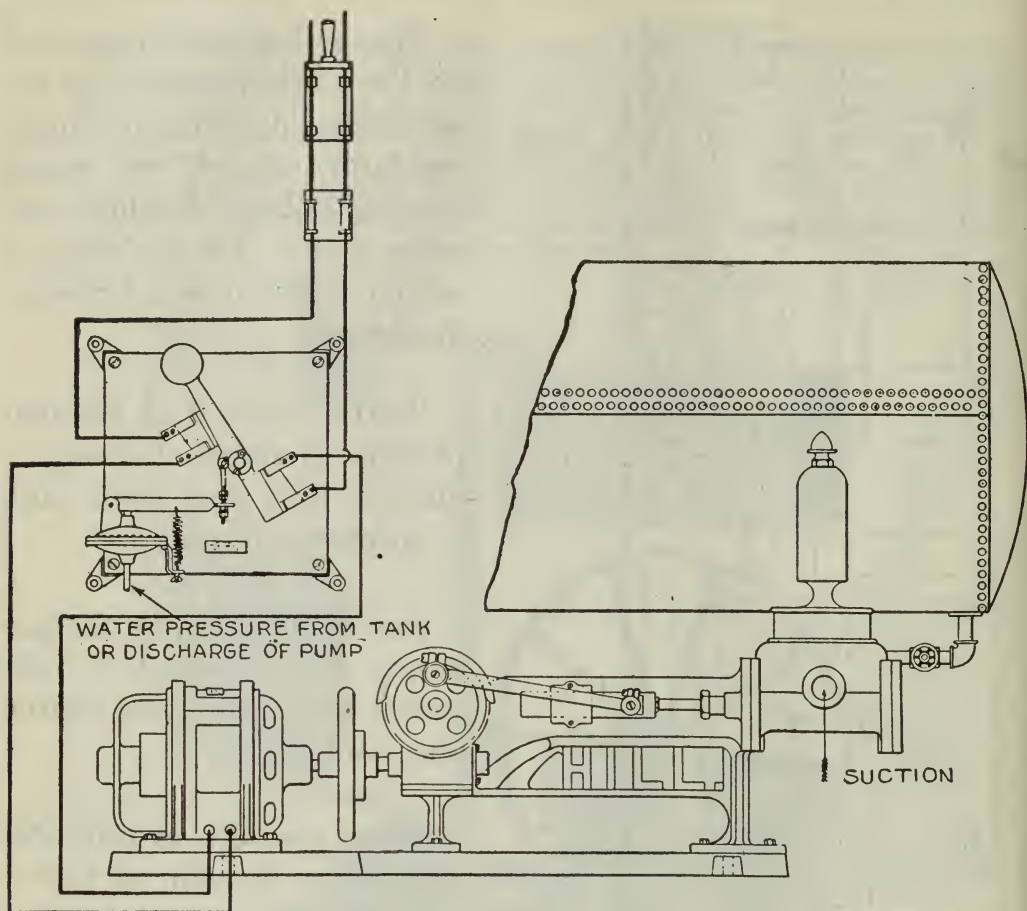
,333.—Hill electric tank pump and *method of pressure control*. The illustration shows a double pole switch connected with a diaphragm pressure regulator, whose operation is described in the accompanying text. The switch here shown is designed for pumps up to  $2\frac{1}{2}$  horse power direct current, and 5 horse power alternating current, 110 or 220 volts. The switch is not intended for a closer regulation than about 15 pounds variation in water pressure. That is, if the switch be set to throw at 50 lbs., it will not throw on again and start the motor until pressure in tank has gone down to about 35 lbs. Sometimes closer regulation can be had, but the former serves for most cases, and avoids the too frequent starting and stopping of the motor.
